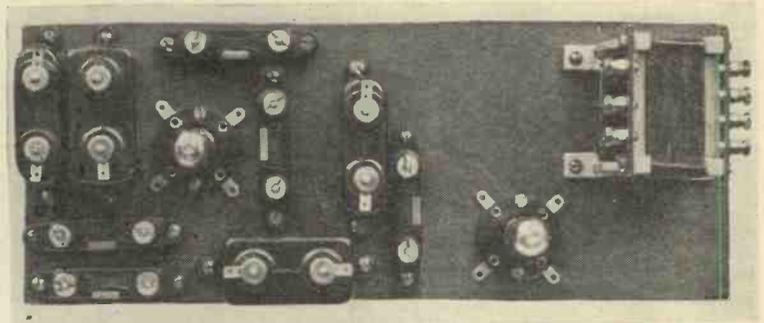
Before building these components should be screwed to the wood baseboard.
